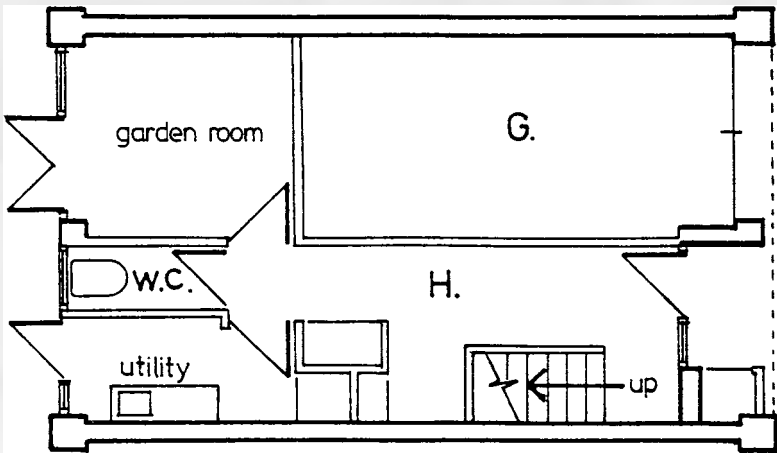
A THREE STOREY TERRACE HOUSE 1966.
